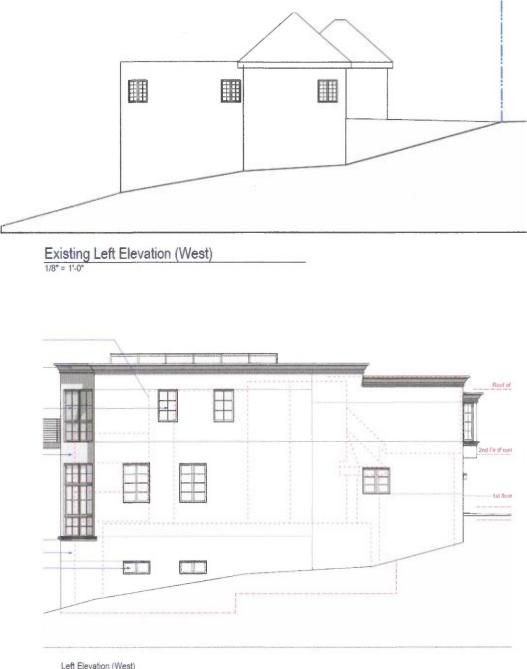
Proposed West Facing Façade is Double the Size of the Existing
